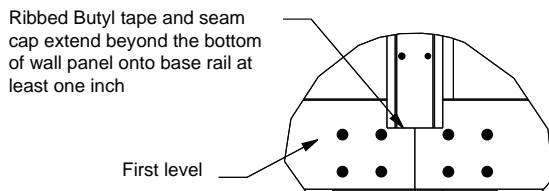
Vertical seam cap installation – extend beyond bottom of wall panel
